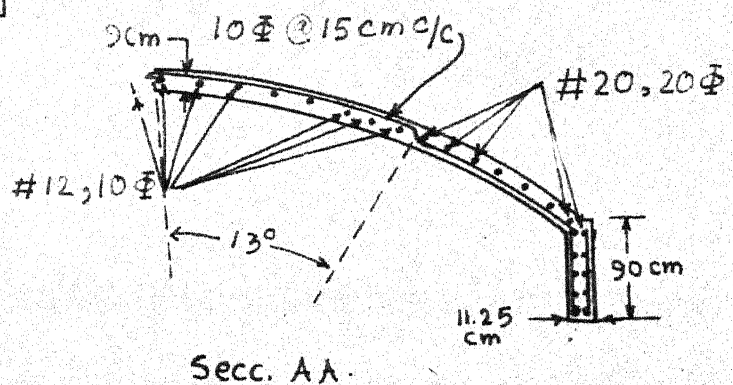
REINFORCEMENT DETAILS (Ex.2)
